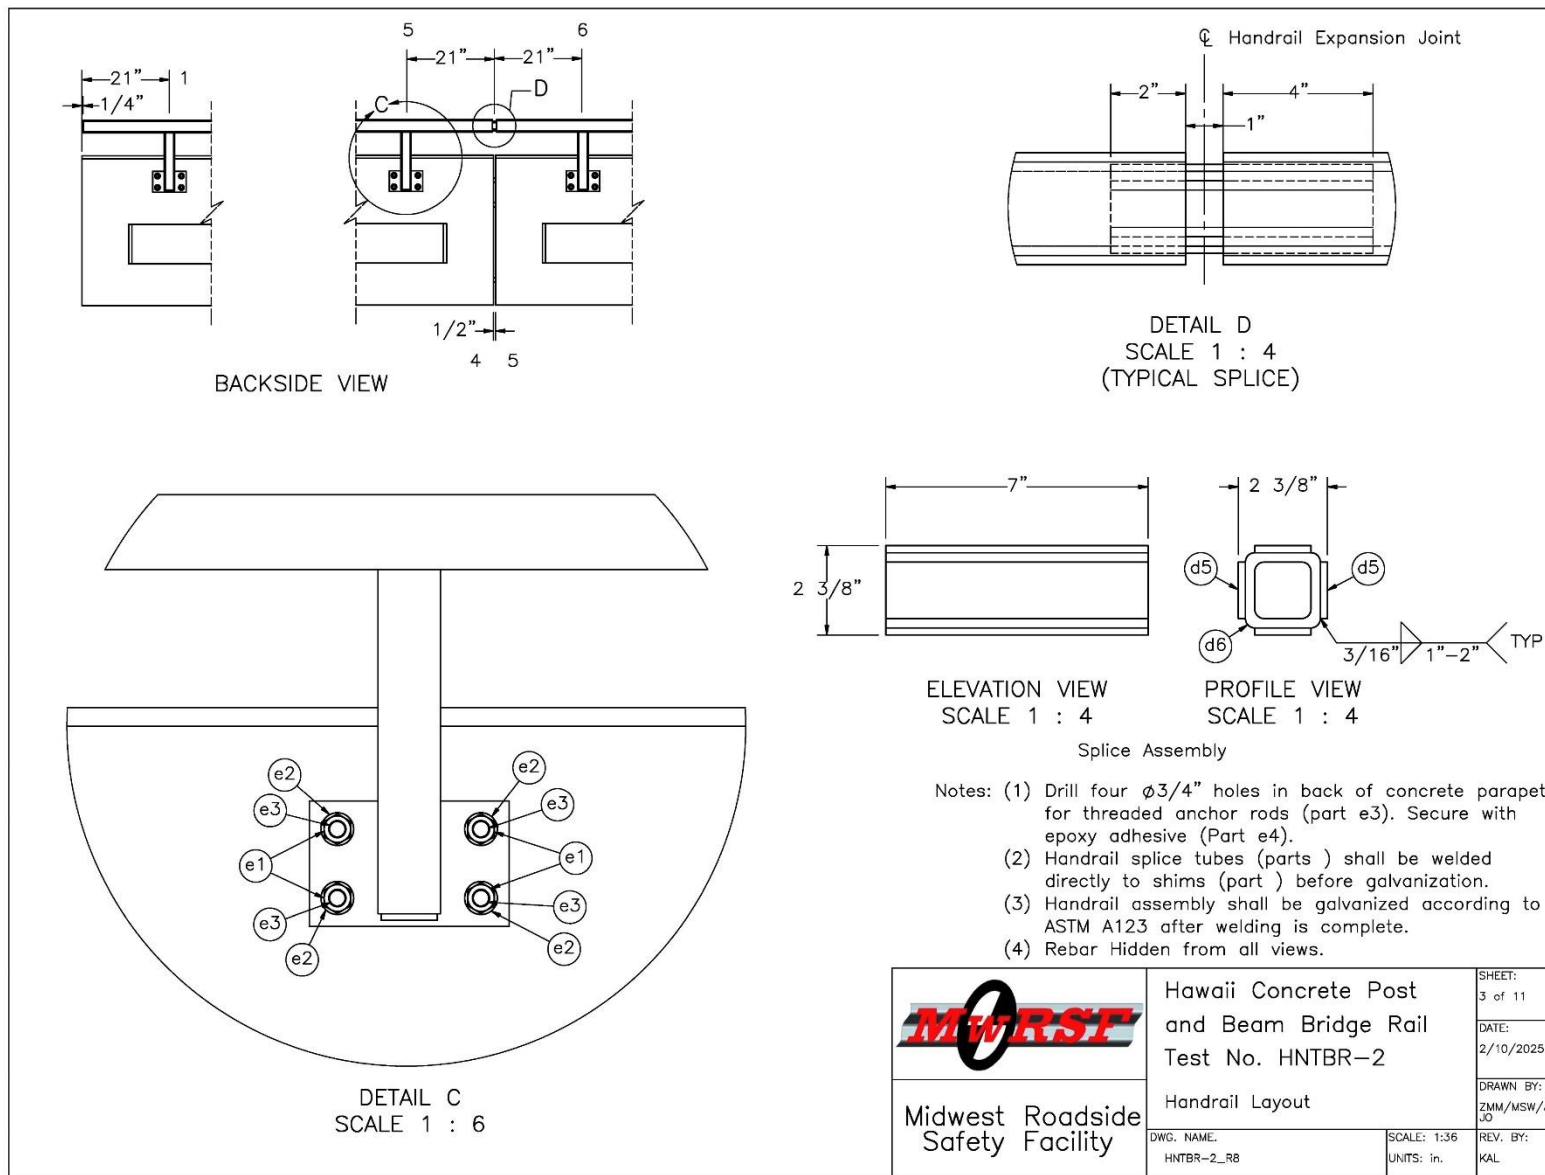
Handrail Detail, Test Nos. HNTBR-2 and HNTBR-3
